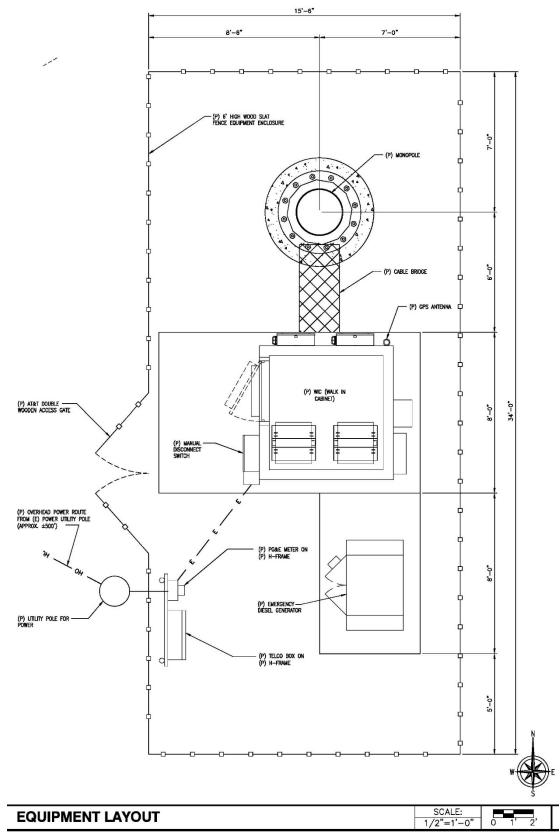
Plan View – Equipment located within the enclosure. (Source: 1)
